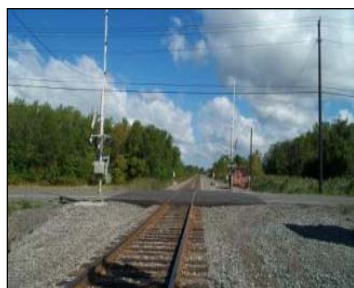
Looking north along CSX track at Jagow Road, CSX MP 16.3
